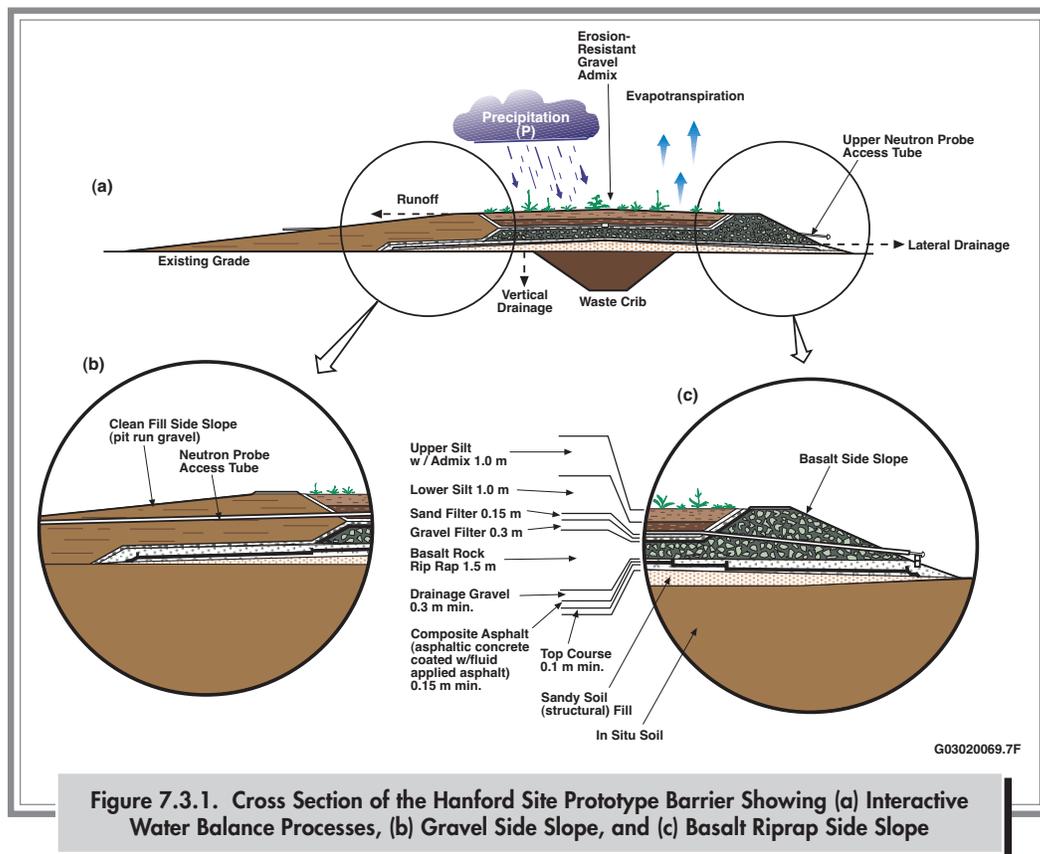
Cross Section of the Hanford Site Prototype Barrier Showing (a) Interactive Water Balance Processes, (b) Gravel Side Slope, and (c) Basalt Riprap Side Slope
